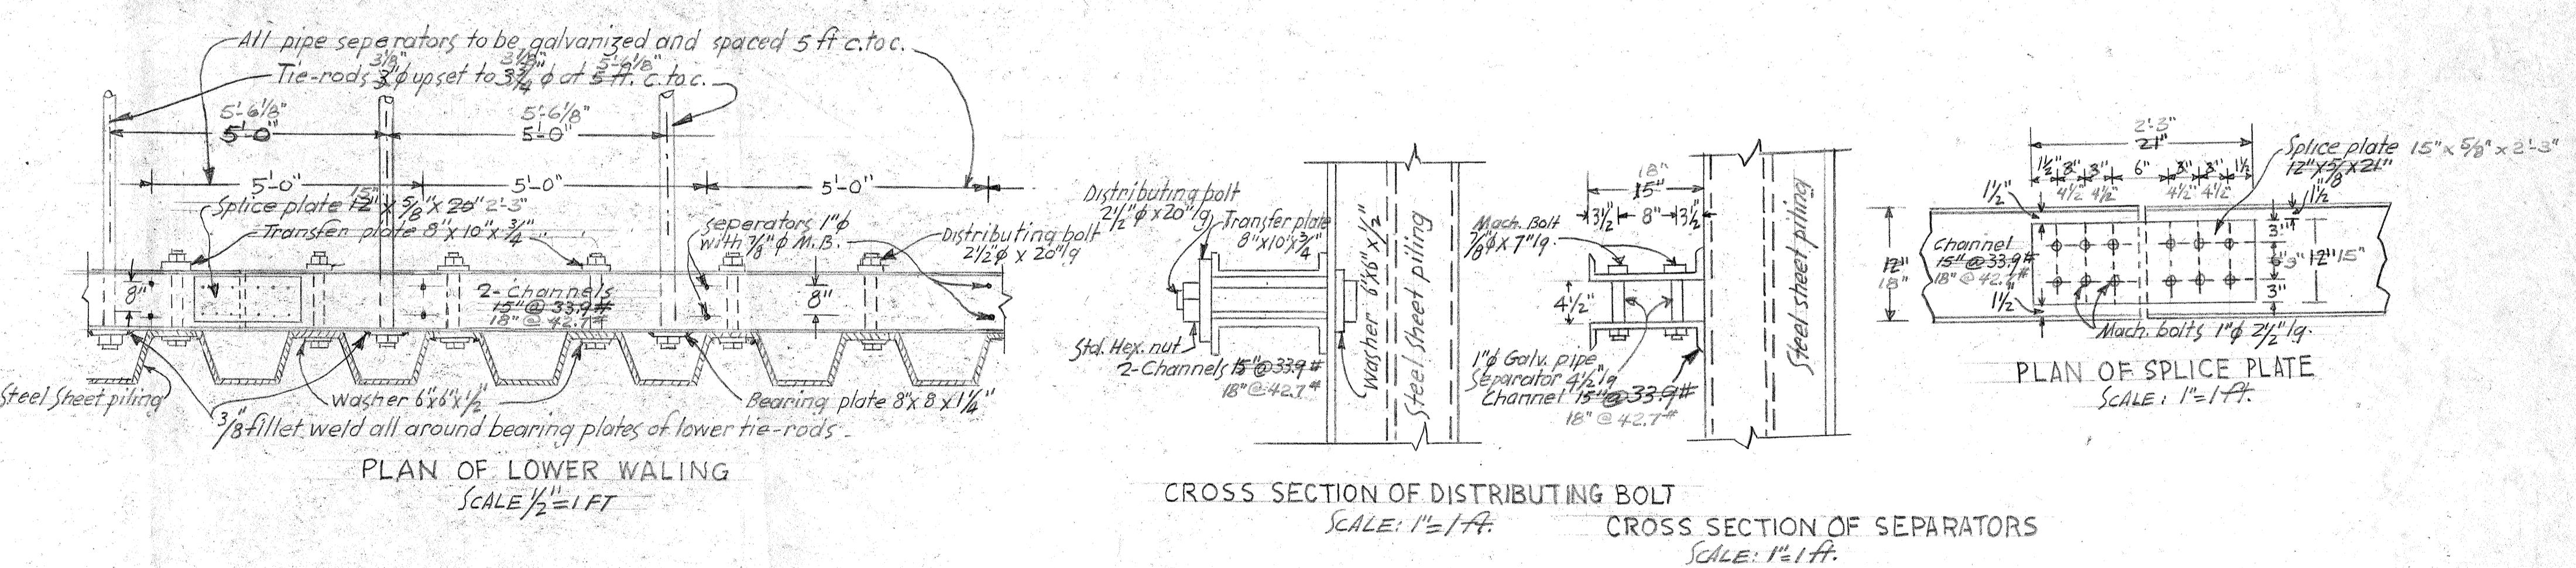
DETAILS OF BOLTING IN STEEL WALING
